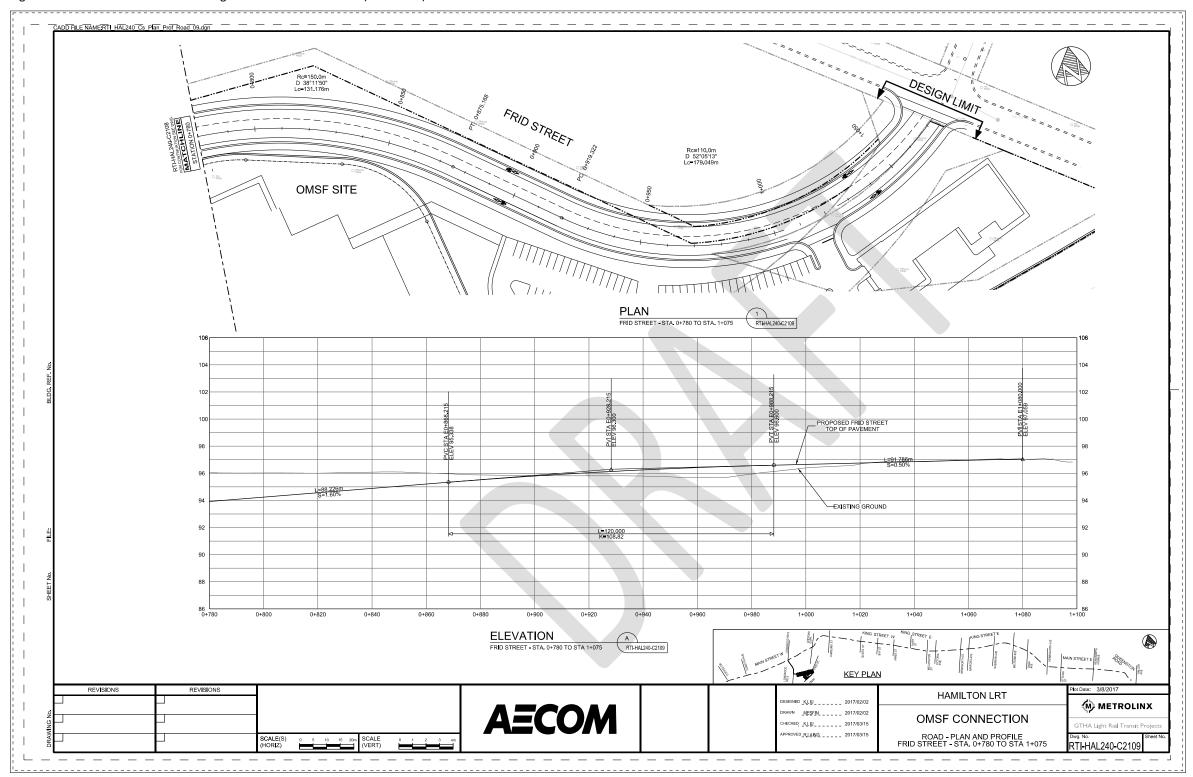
Frid Street Extension Re-alignment – Plan and Profile (continued)
